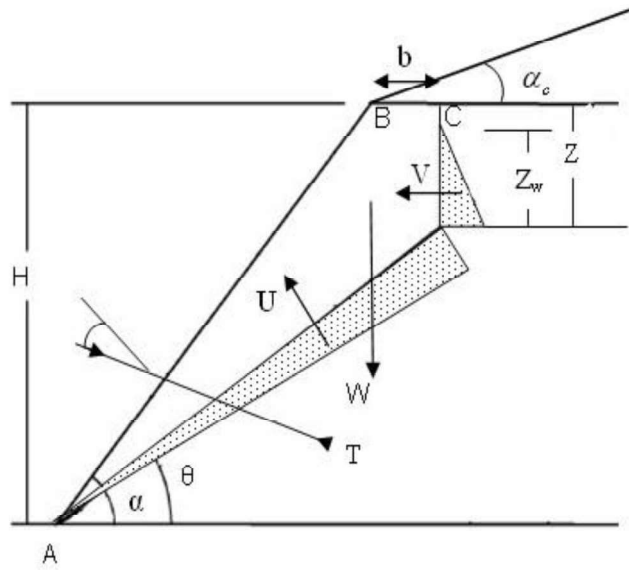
Geometry of slope with tension crack in upper slope and its interaction with rock bolt
